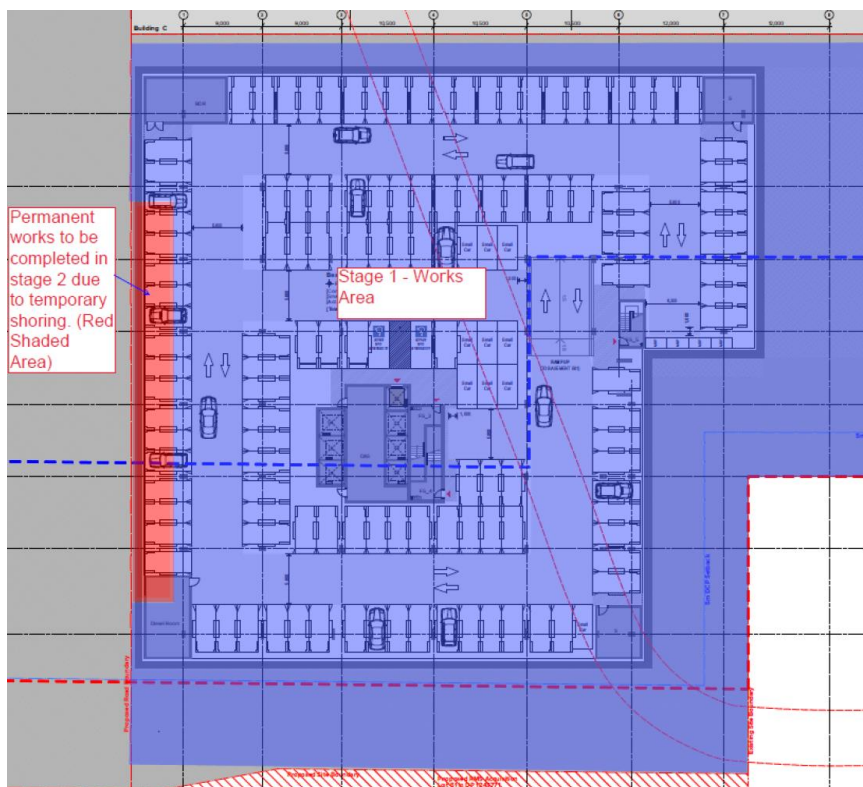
Area of basement shoring Stage 1 and Stage 2 works. Source: Staged Construction Management Report prepared by EI Australia dated 15th July 2021.
